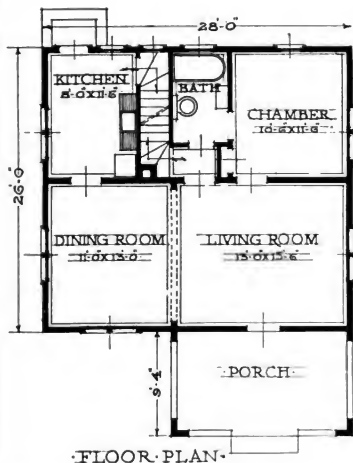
FLOOR PLAN OF CONCRETE BUNGALOW.
